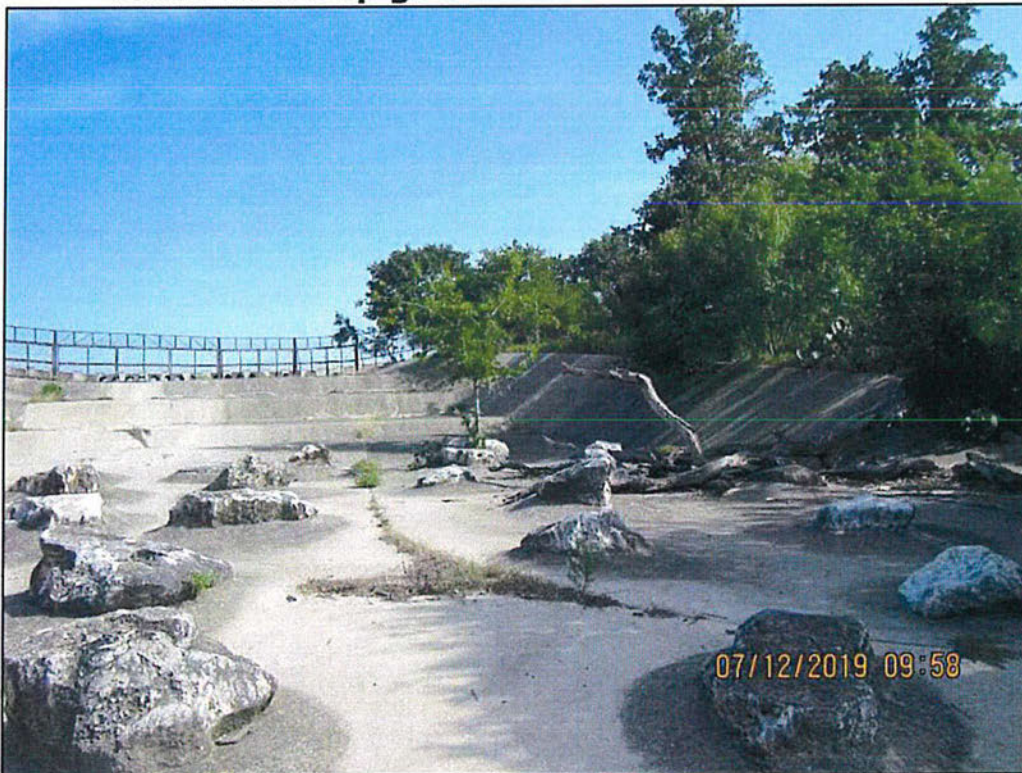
Service spillway. Looking upstream. Note vegetation.
